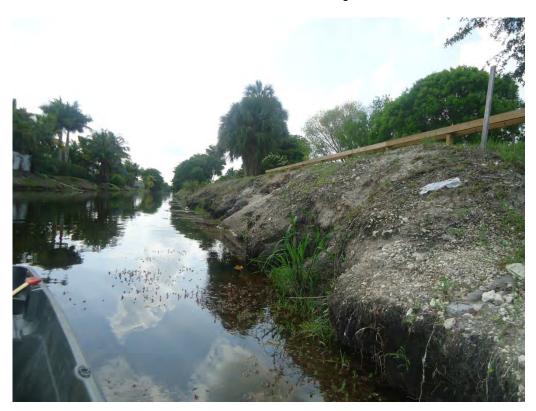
Canal Section 3.11-3.6 – View is to West, showing North side similar slope conditions.
